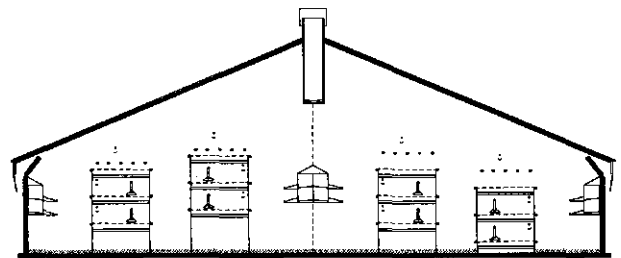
Example of an alternative housing system for laying hens: the Tiered Wire Floor aviary system.
